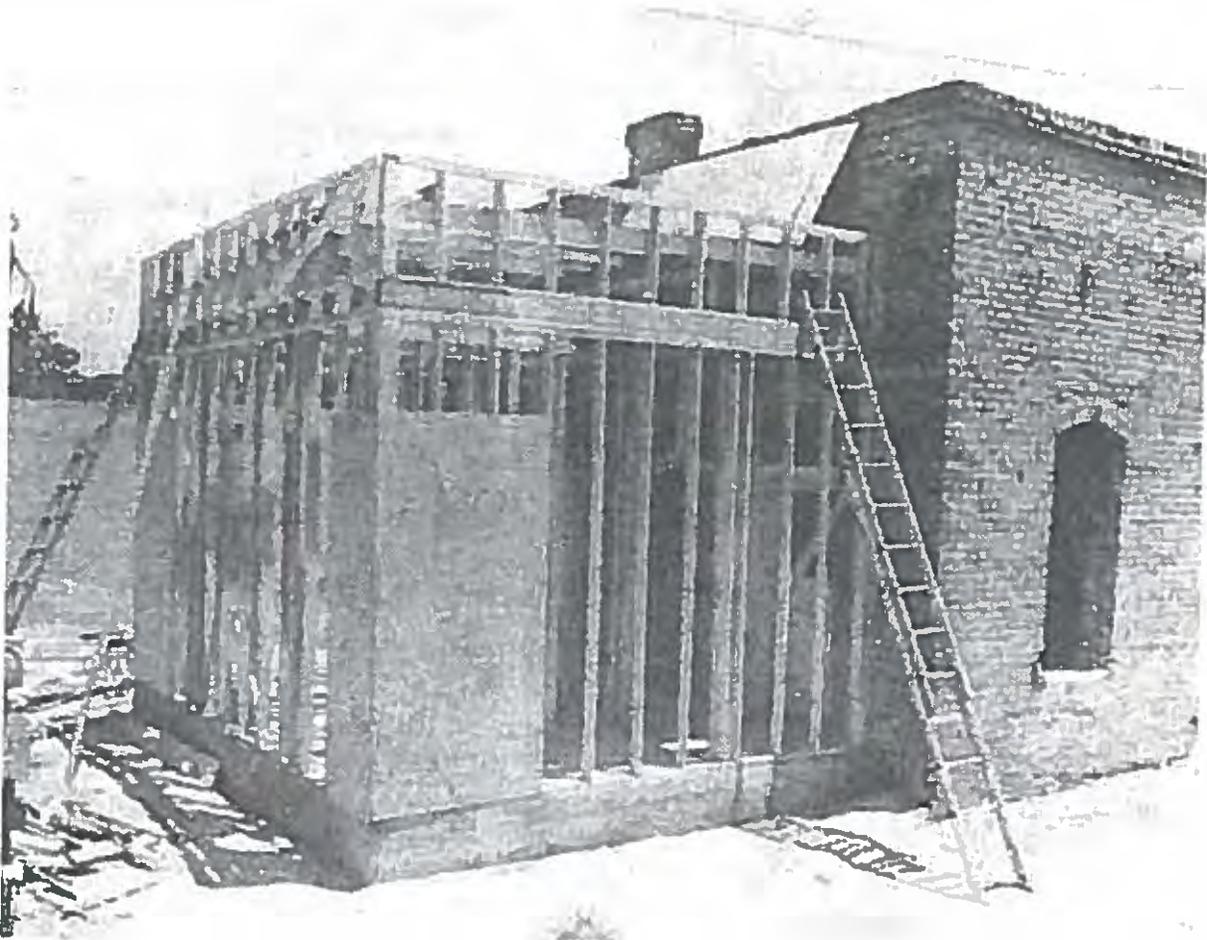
View of rear of building during construction of addition during c 1980s. (Source: Lindale Public Library Vertical Files)
